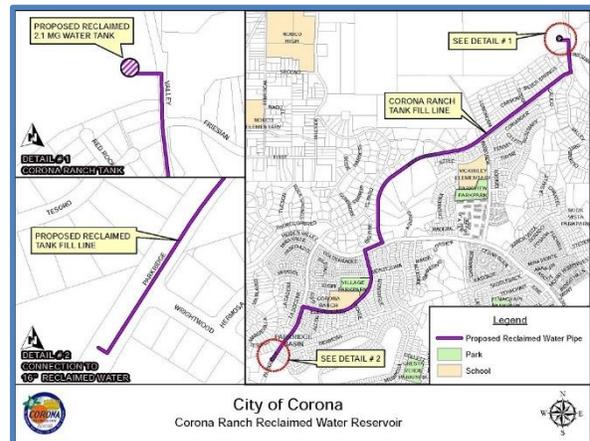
Corona Ranch Reclaimed Water Tank
